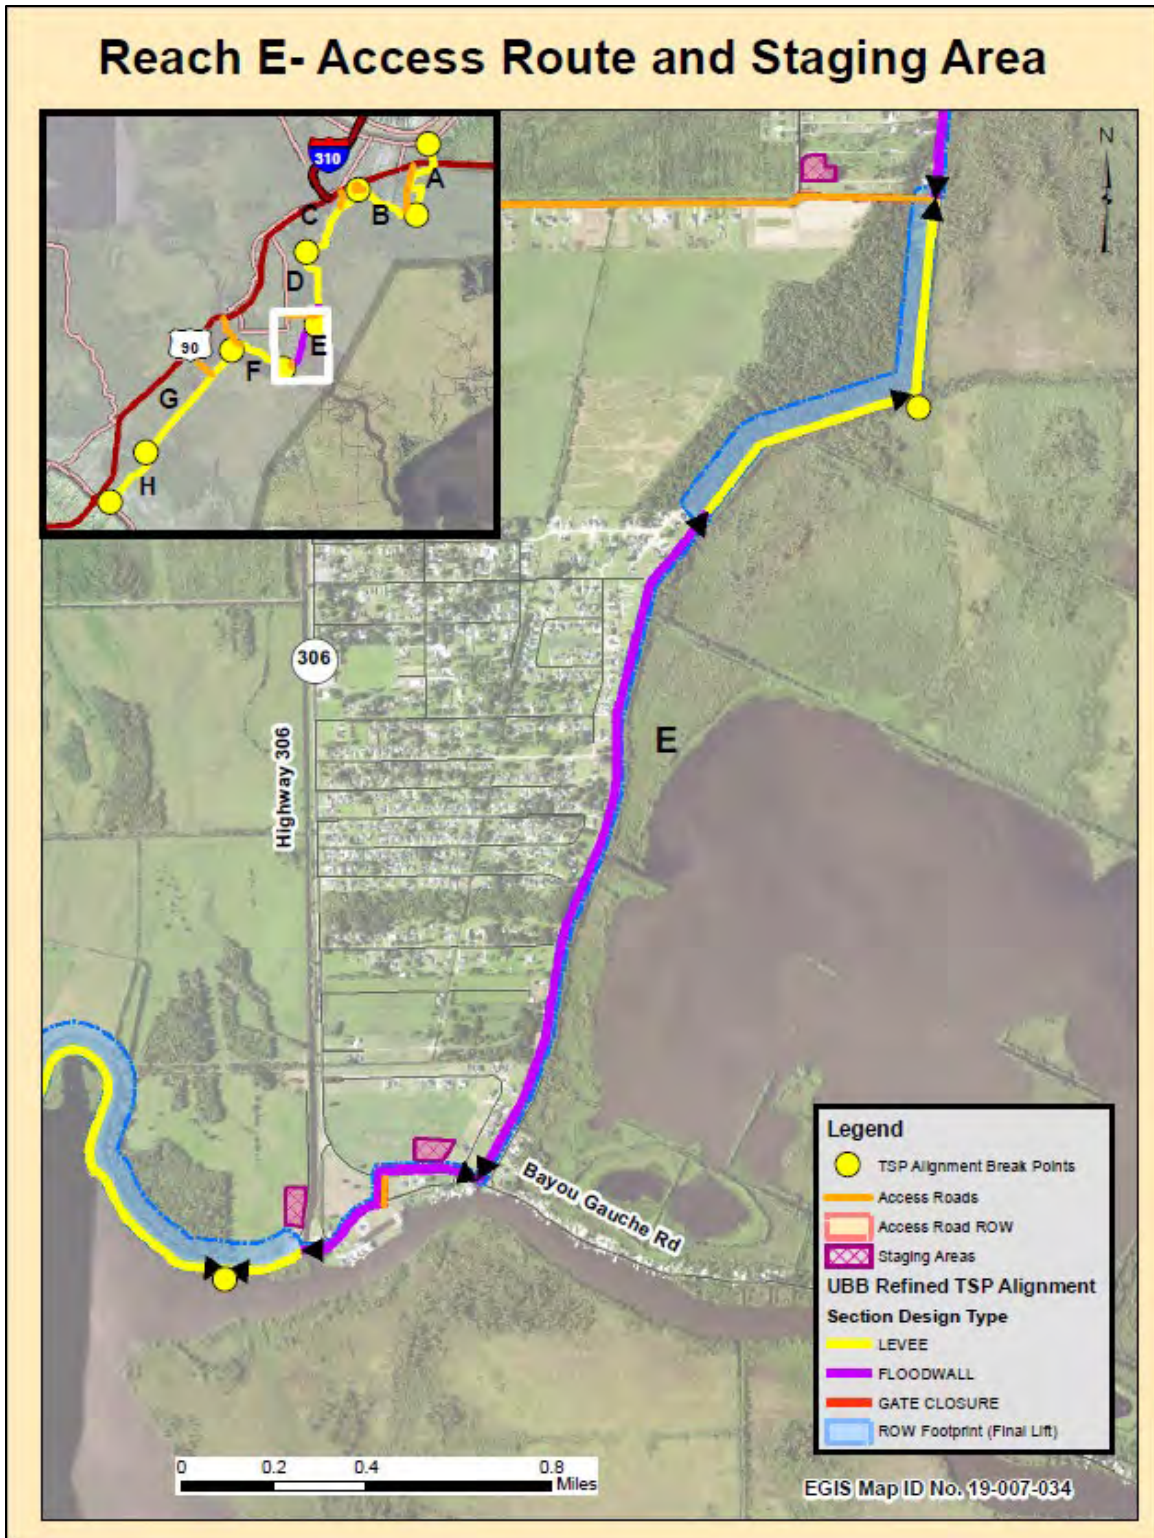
Hydraulic Reach E Access Road and Staging Area
